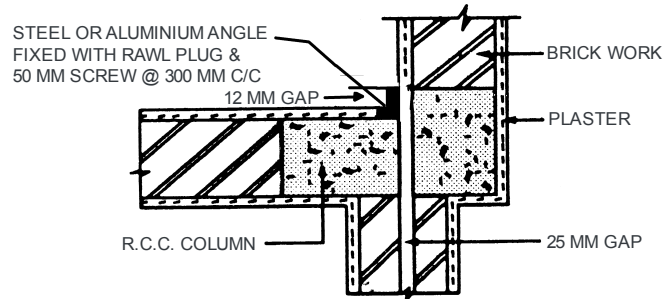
Typical Details of Expansion Joints at Corner Column
